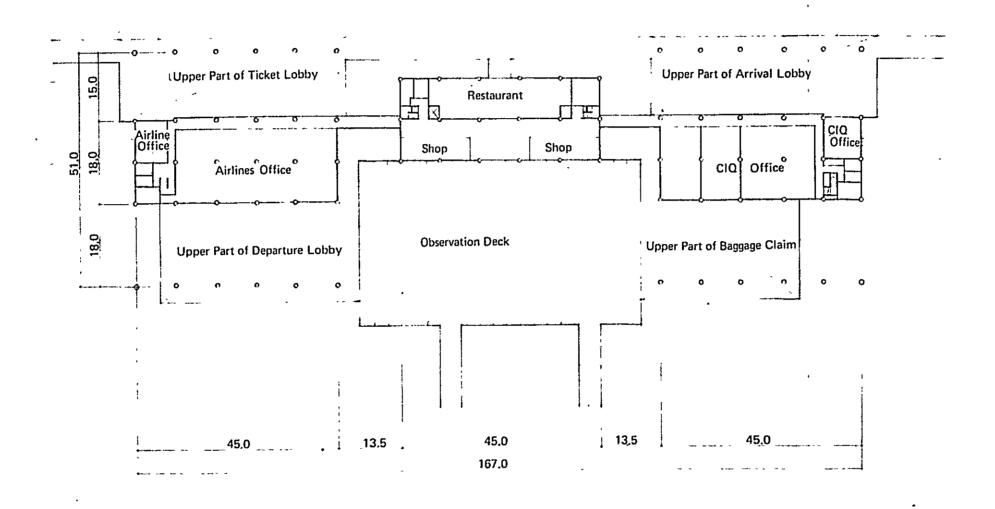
Proposed International Airport Terminal Building 2nd Floor Plan
